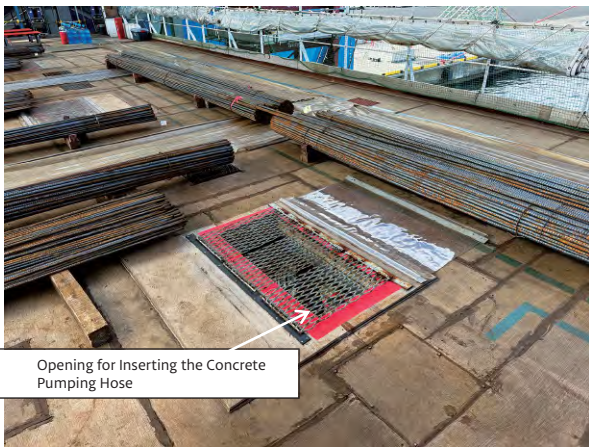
Temporary Rebar Staging and Openings on the Upper Level
